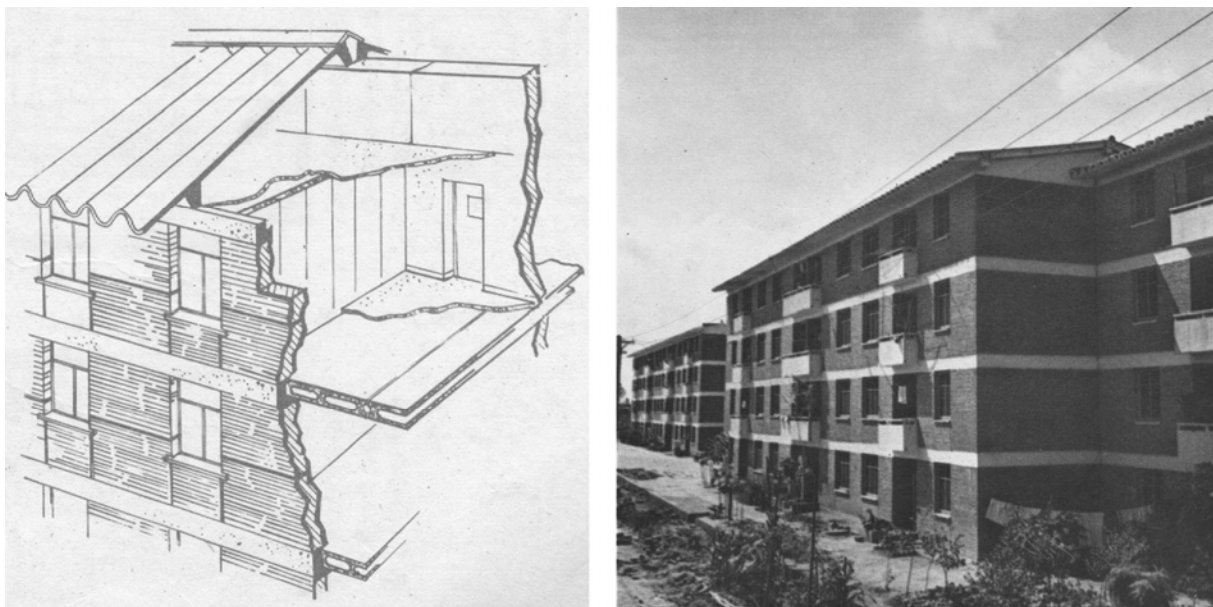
Prefabricated housing in Beijing, 1958, built with block bricks, prefabricated concrete floor slabs, and prefabricated concrete wave-shaped roof tiles
